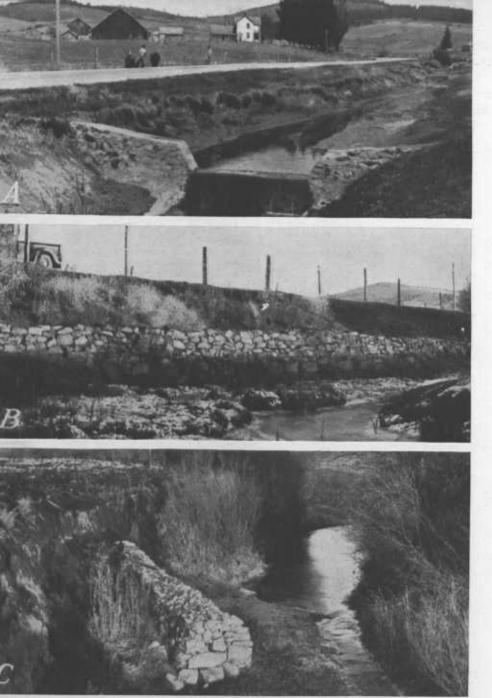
Some permanent structures used in soil- and water-conservation programs in the Pacific Northwest: A, Masonry dam for stabilizing a gully along a highway; B, rock-wire revetment to protect stream bank from sloughing and destroying roadbed; and C, a jetty, also for stream bank and bottom land field protection.
